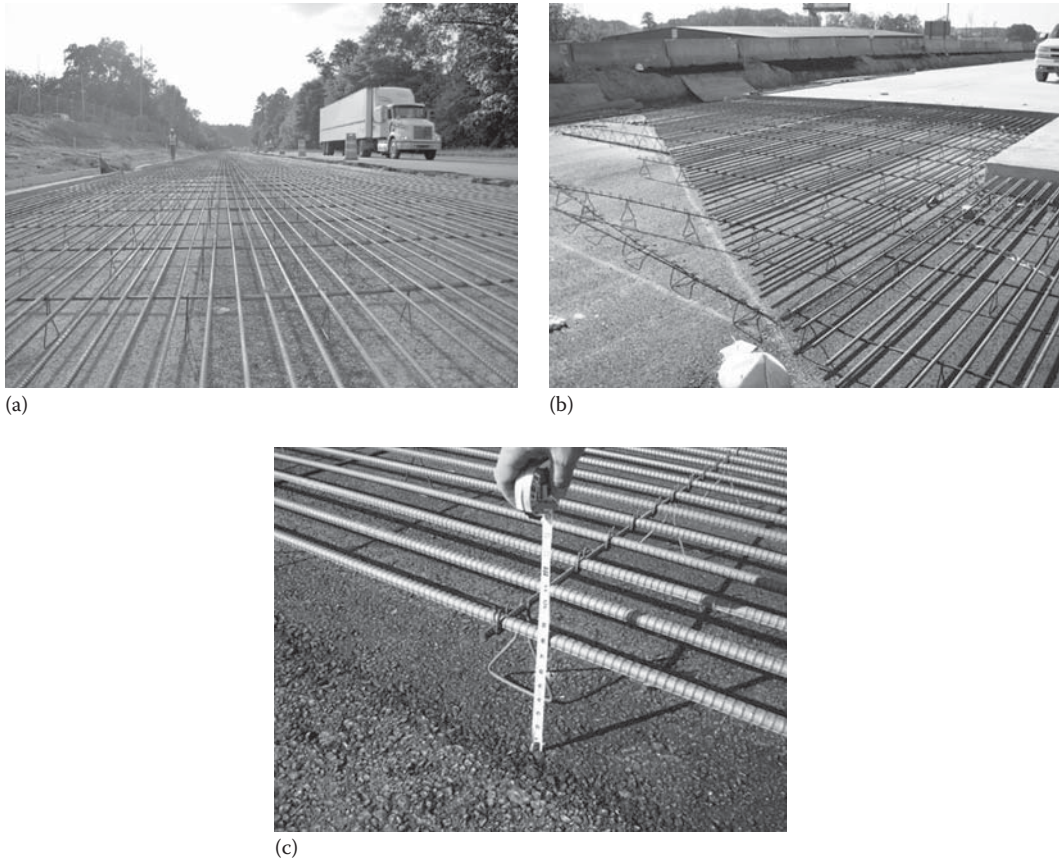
Steel reinforcement in CRCP pavement: (a) continuous reinforcement; (b) skewed reinforcement splicing; (c) checking rebar elevation. (Courtesy of Wouter Gulden, ACPA-SE Chapter, Duluth, GA.)
